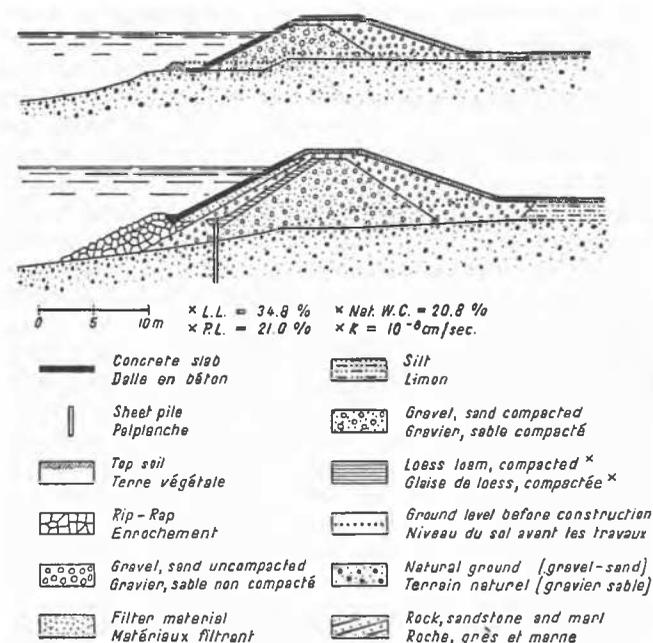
Sections of the Upstream Embankment, Rapperswil-Auenstein
